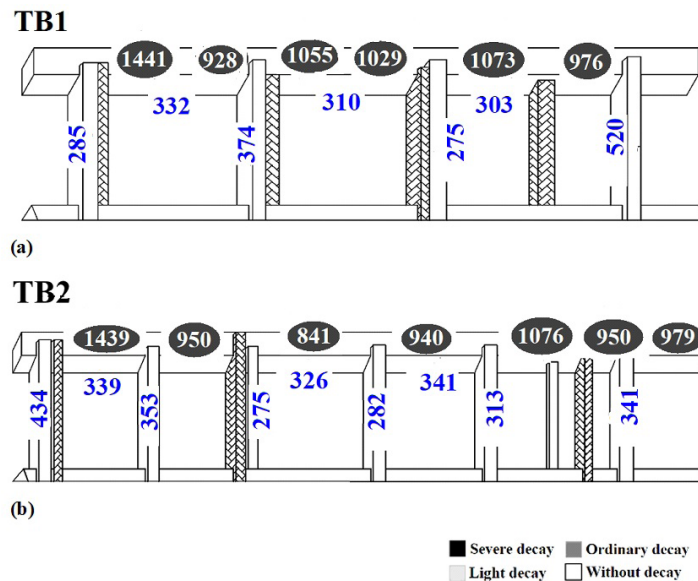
TWT (μ s) in wood of truss (see Fig. 8 for more details).
